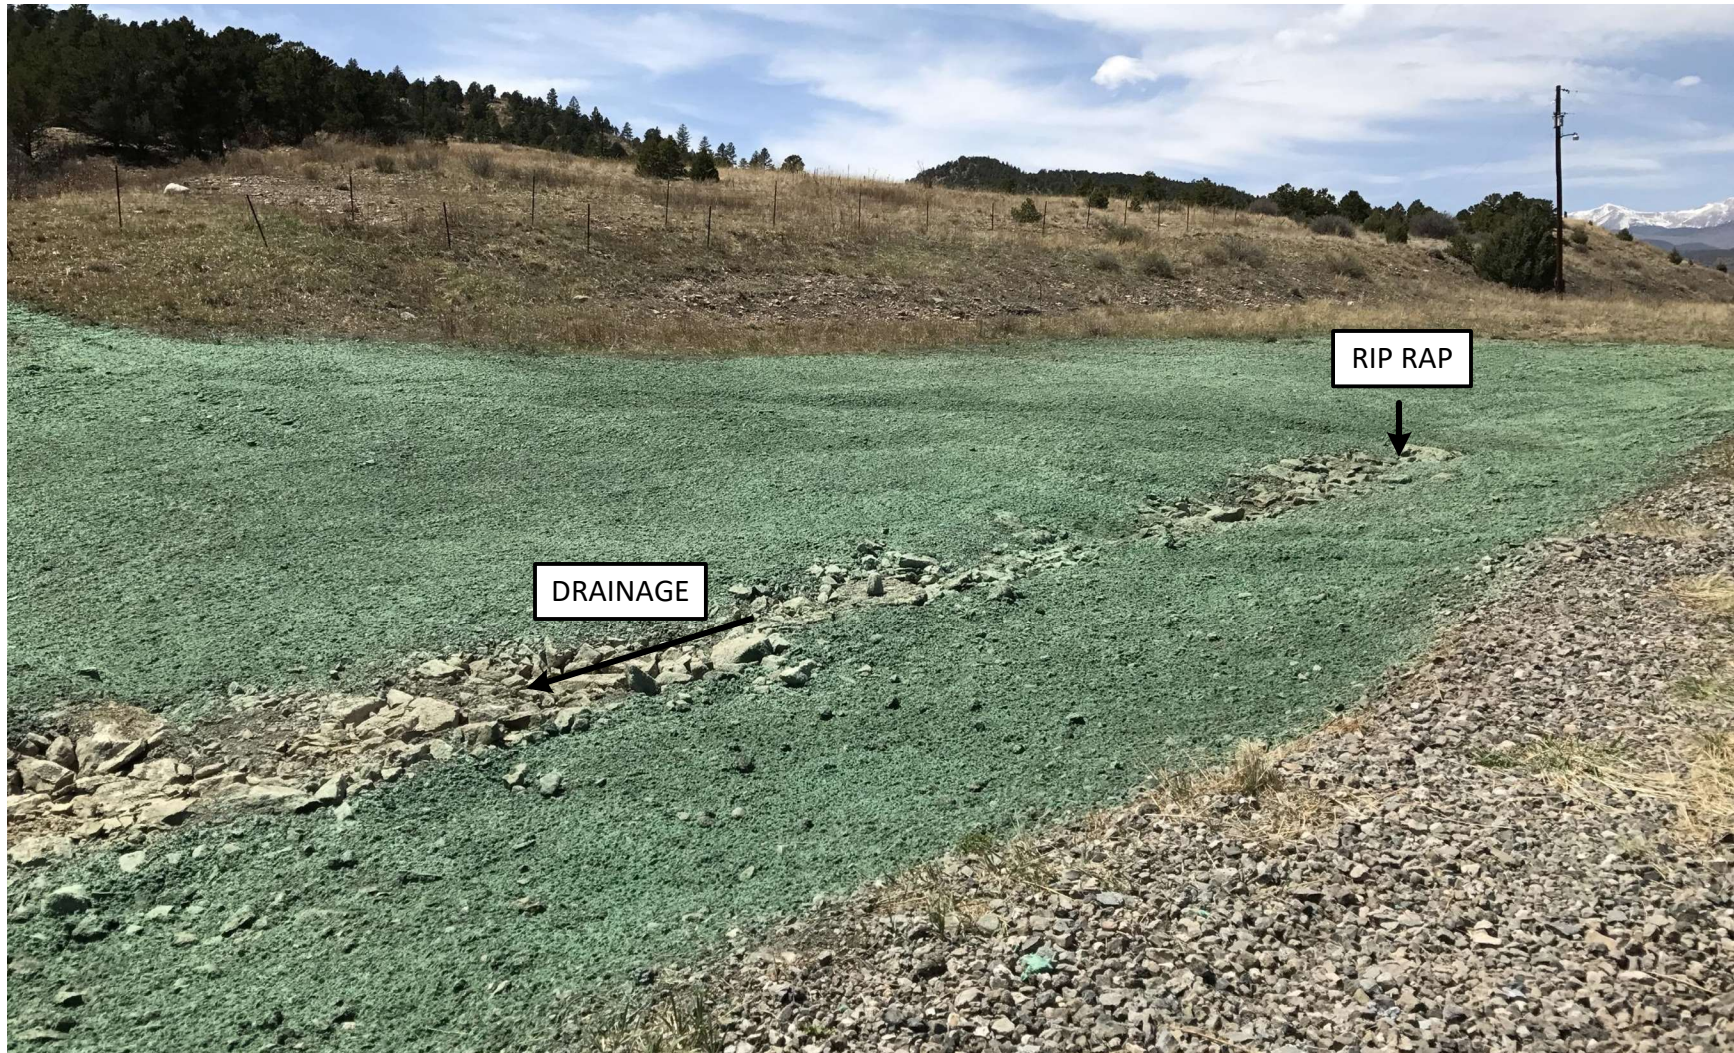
FACING SOUTHWEST ACROSS THE GOLDEN EAGLE MINE 28-12 (SD-1) PAD RECLAMATION. SWELLED OUT THE ORIGINAL DRAINAGE DITCH AND INSTALLED RIP RAP FOR SOIL STABILIZATION.
